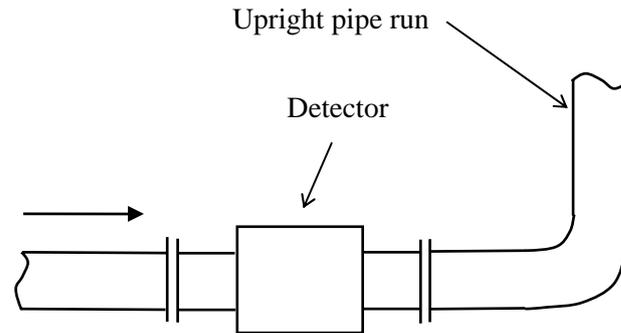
Detector with an upright pipe run at the downstream outlet
